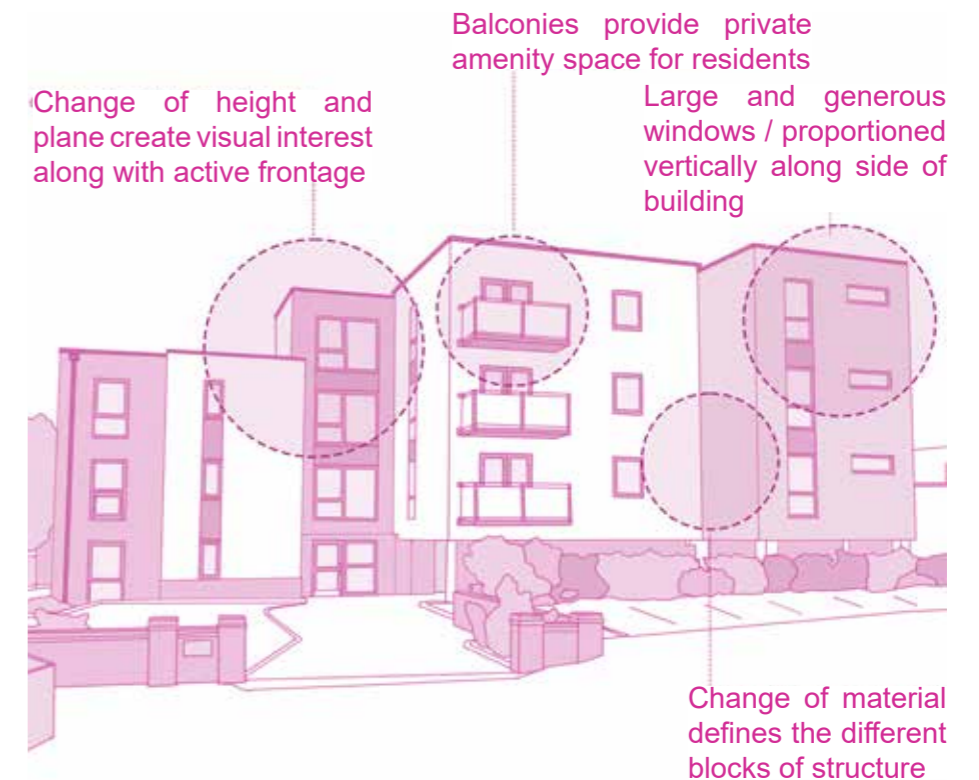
Diagrammatic view of new apartment block South of London Road
